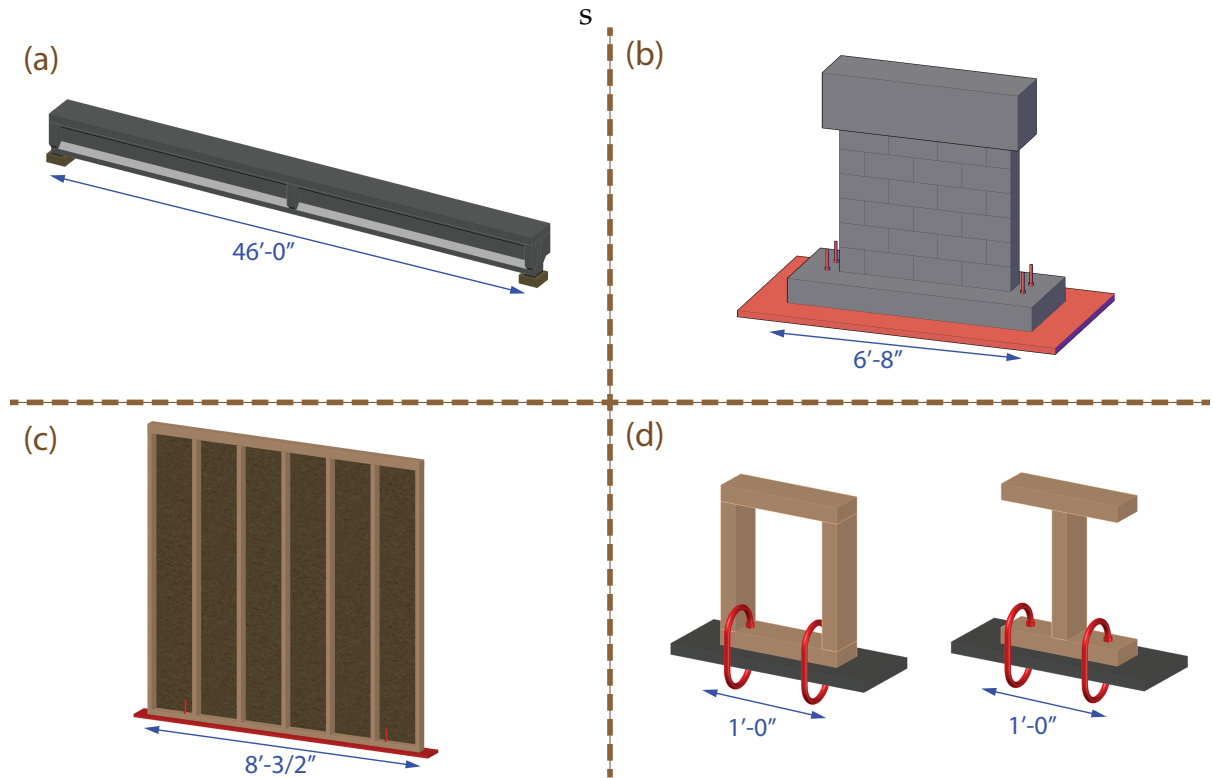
AutoCAD drawings of the tested specimens highlighting overall dimensions and testing boundary conditions: (a) prestressed concrete girder, (b) masonry wall; (c) timber wall, and (d) timber joints, see Table 3 for full dimensions
